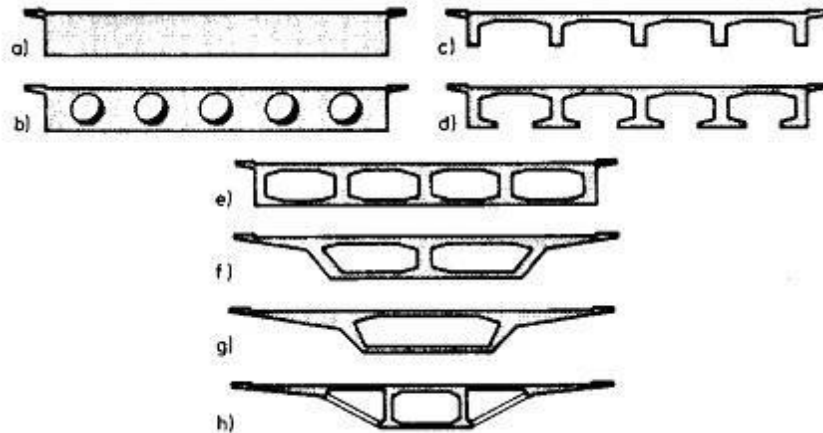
evolution of box girder beams.[Aalto University School of Engineering Department of Structural Engineering and Building Technology Rak-11.3001 Design of Bridges].
